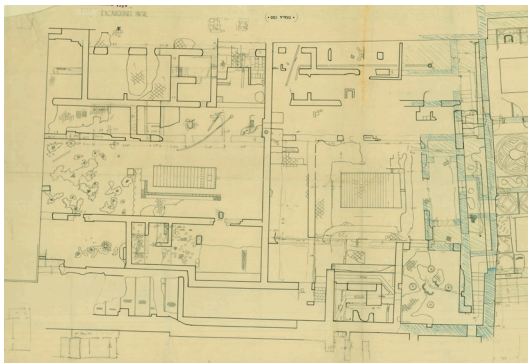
Plan of the Excavations at the Partial. Northwest Corner Sector. Excavations of the Palacio de Mondéjar, 1930, L. Torres Balbás. Tracing paper, ink, and coloured pencils, 67 x 132 cm (APAG / Plan Collection / P-001443).
